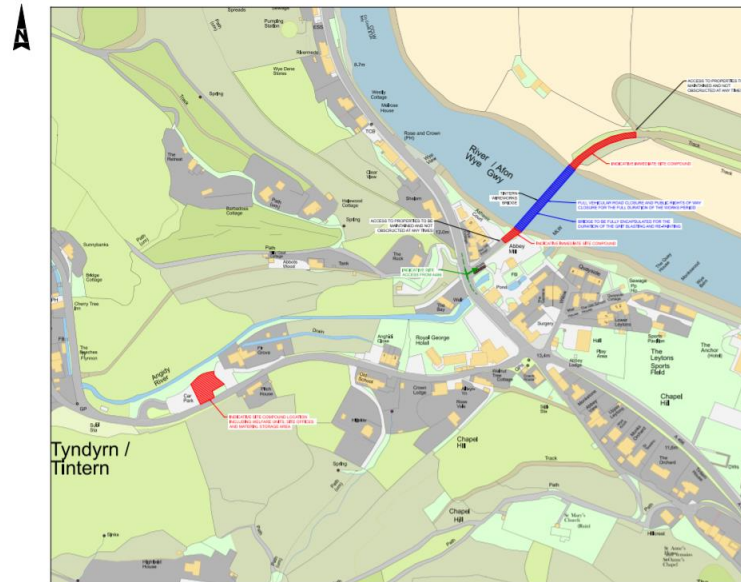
General arrangement plan. Site location in blue. Proposed site compounds shown in red
